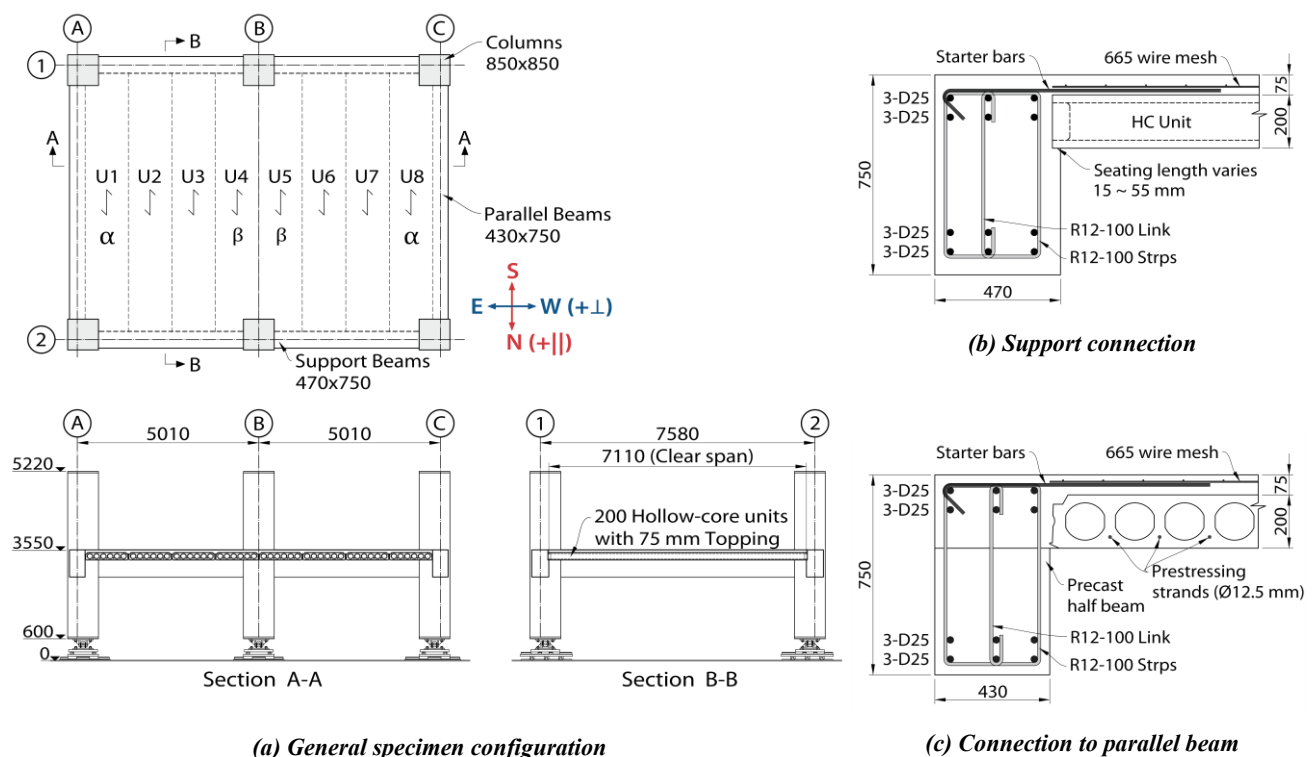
Super-assembly test specimen with nominal dimensions (modified from Bükér et al. [39]).
